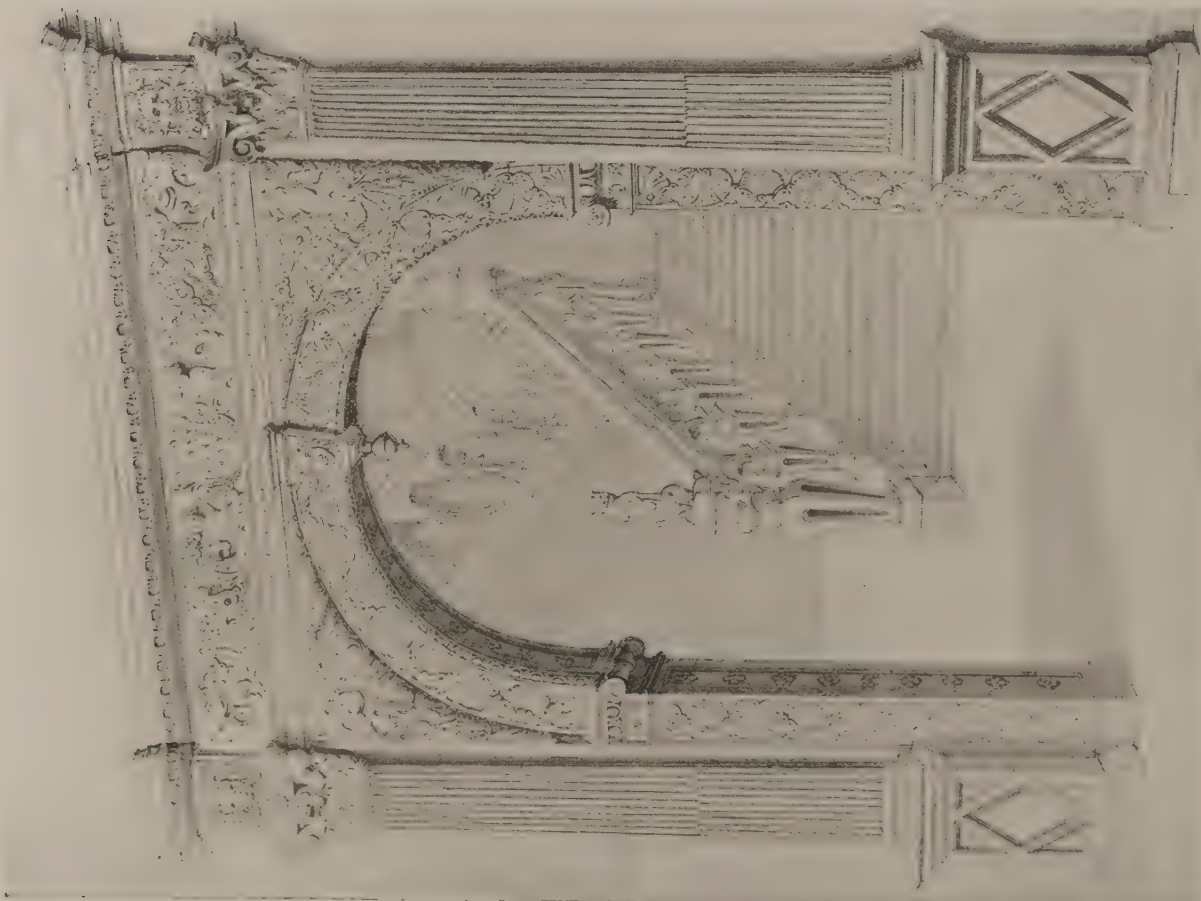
DRAWING OF AN ARCHWAY TO STAIRCASE HALL
